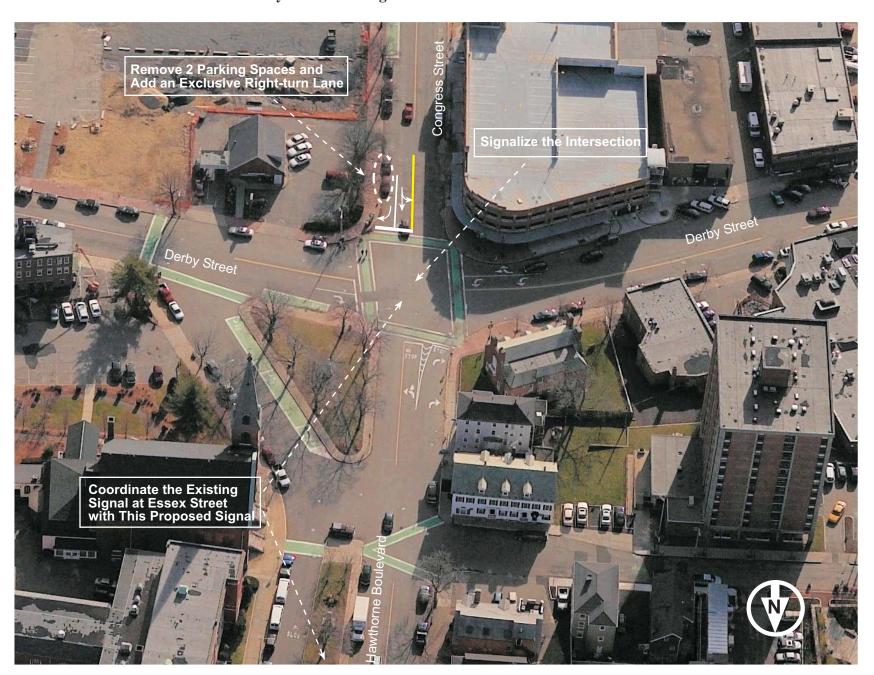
Proposed Intersection Improvements: Derby Street at Congress Street/Hawthorne Boulevard
